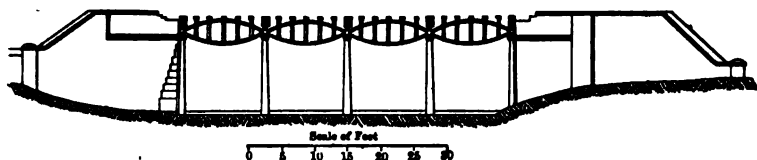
Diagram Elevation of Iron Railway Bridge Built in 1823, for the Stockton & Darlington Ry., England.
